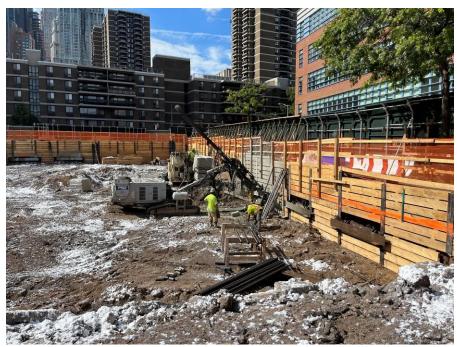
CCJV installing tie-back rods in the eastern site boundary of the site (facing northeast)
